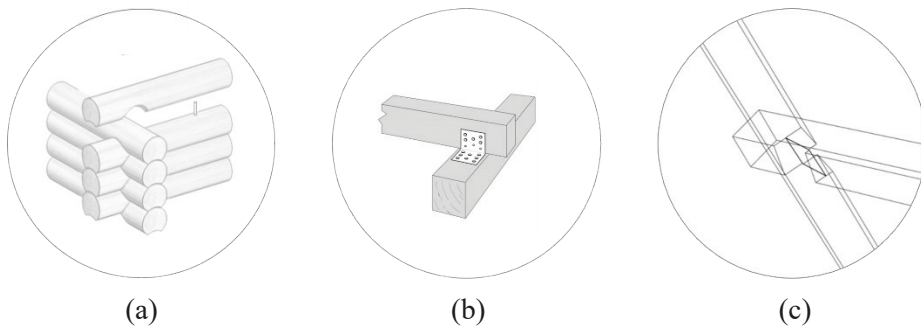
(a) Vernacular log joint (b) Timber beam connection via steel plates and fasteners (c) Interlocking non-planar joinery
